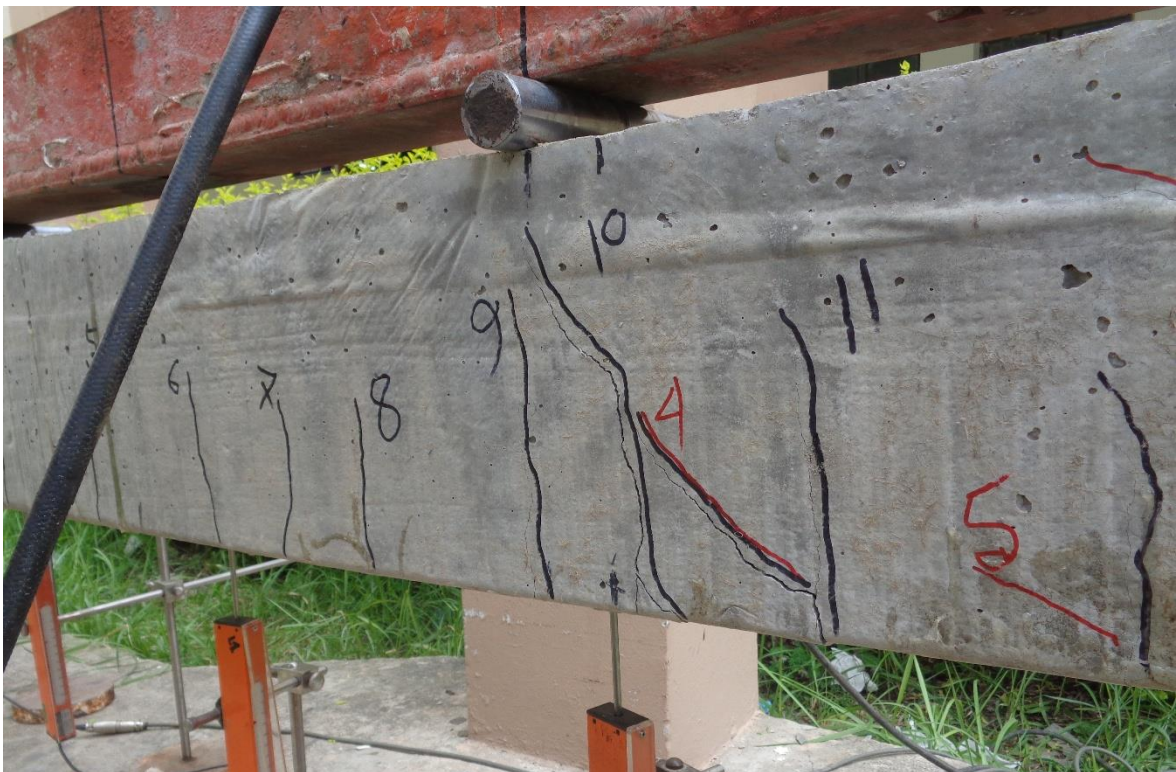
Failure mode of beam strengthened with NSM bars (B4-1)
